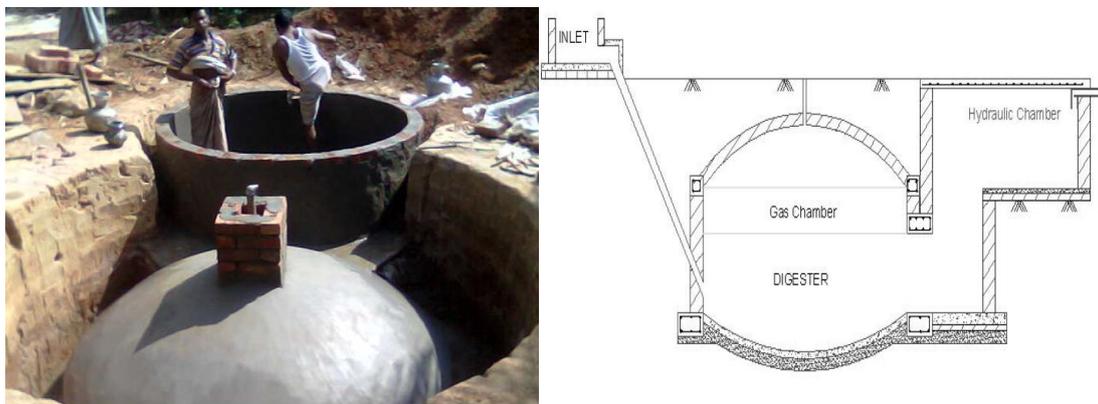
Construction of Brick-Sand-Cement fixed dome domestic biogas plant
